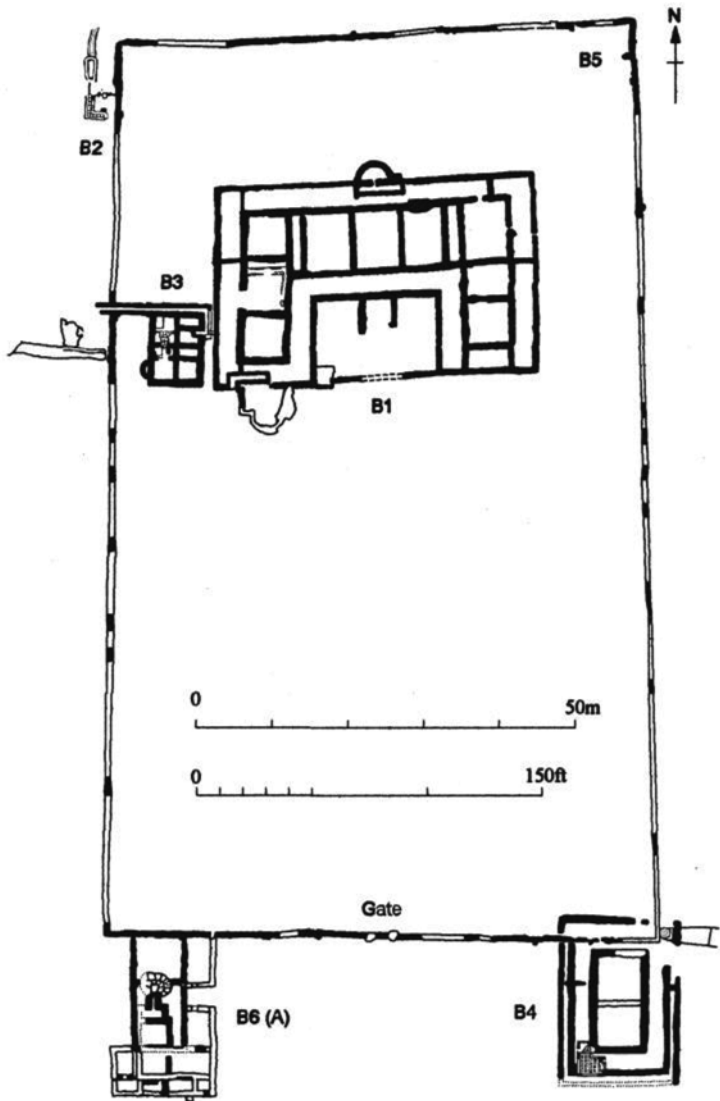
General plan of the villa complex showing the position of Building 4 in relation to the villa enclosure wall and main house.
